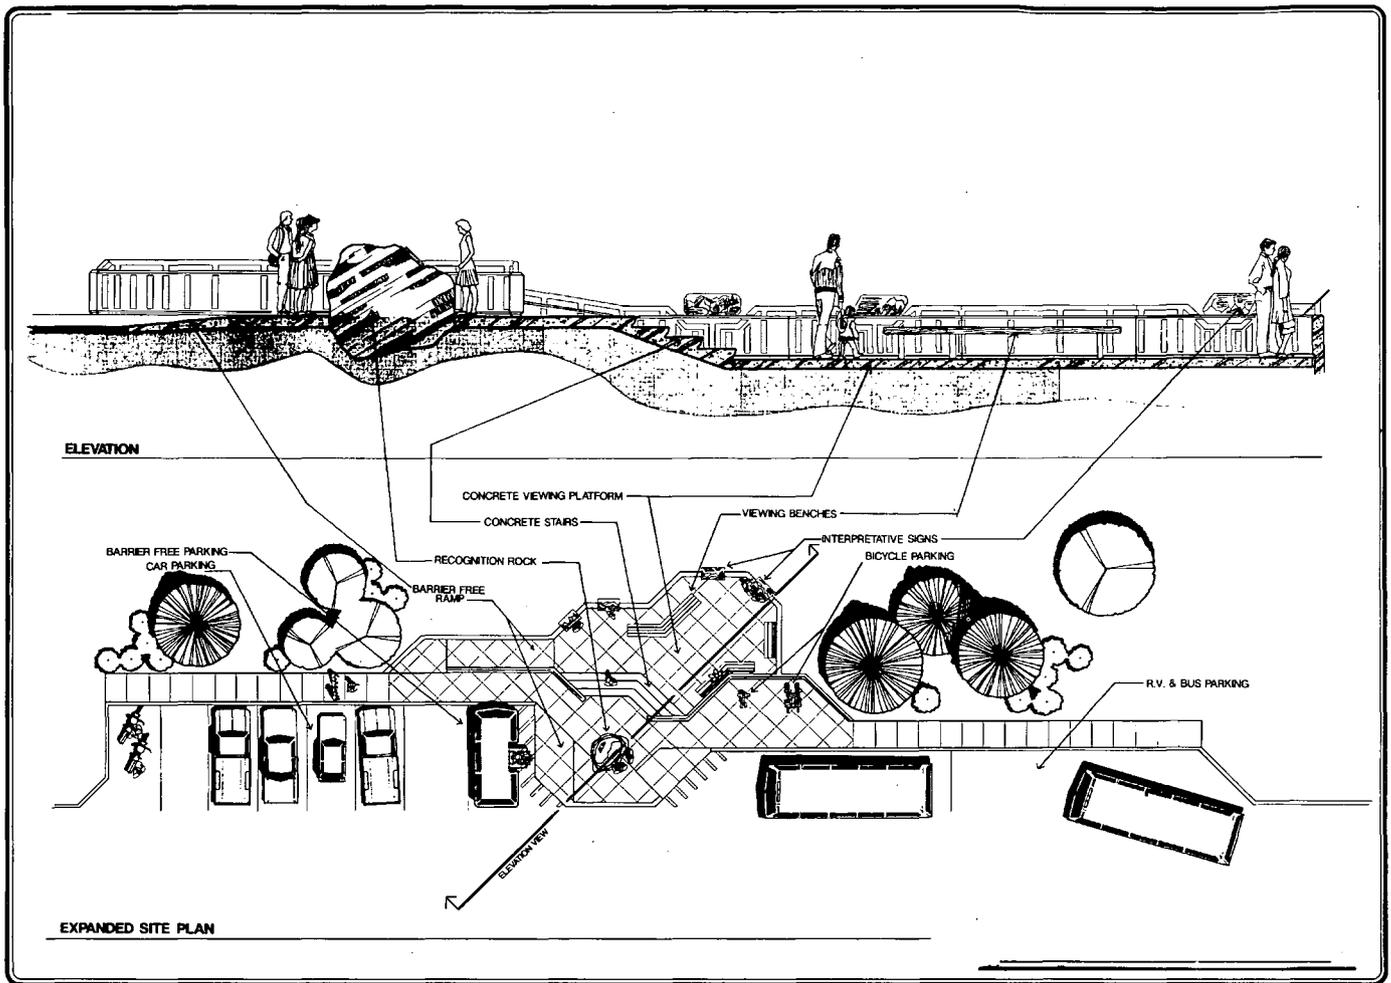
Section detail (top) and plan (bottom) of standard plan for proposed interpretive facilities.
